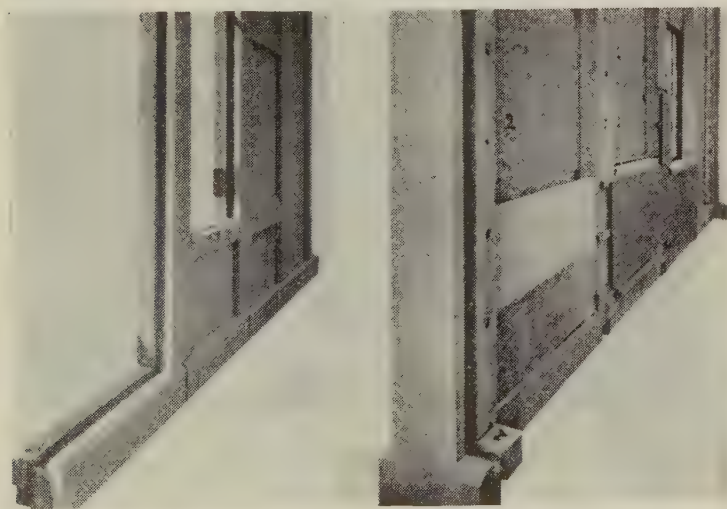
CONSTRUCTION DETAILS, SWAN HOUSE SYSTEM
